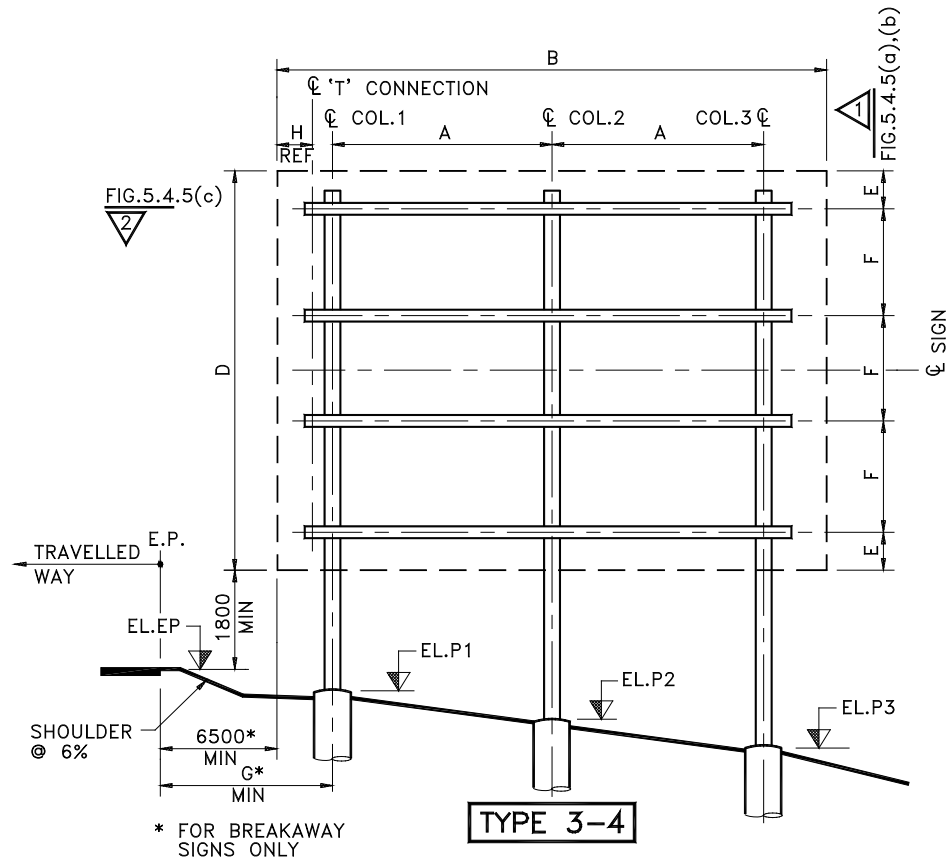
(d) ASSEMBLY AND INSTALLATION DIMENSIONS
